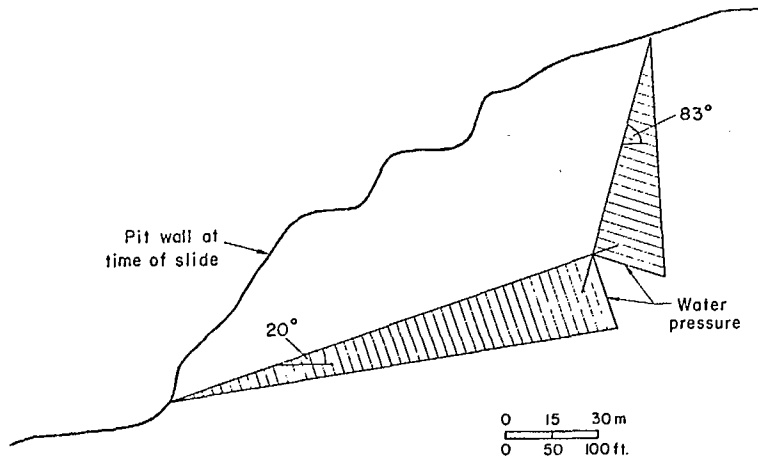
A simplified section through the wall of a pit where a large slide occurred. The height of the slide was 430 ft (131 m) and the average slope angle was 45°. The breadth of the slide was approximately 700 ft (214 m). Sliding seemed to occur on a flat lying discontinuity aided by steeply dipping joints that probably trapped water to provide hydrostatic pressures.
